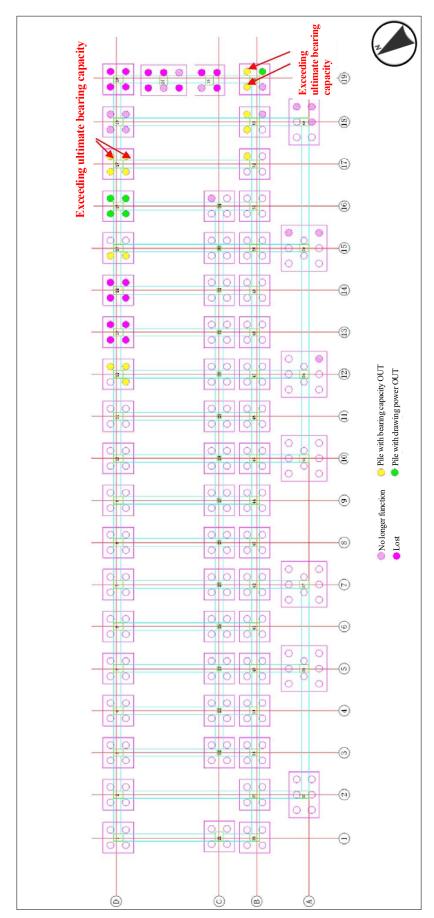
Pile bearing capacity / drawing power OUT parts
